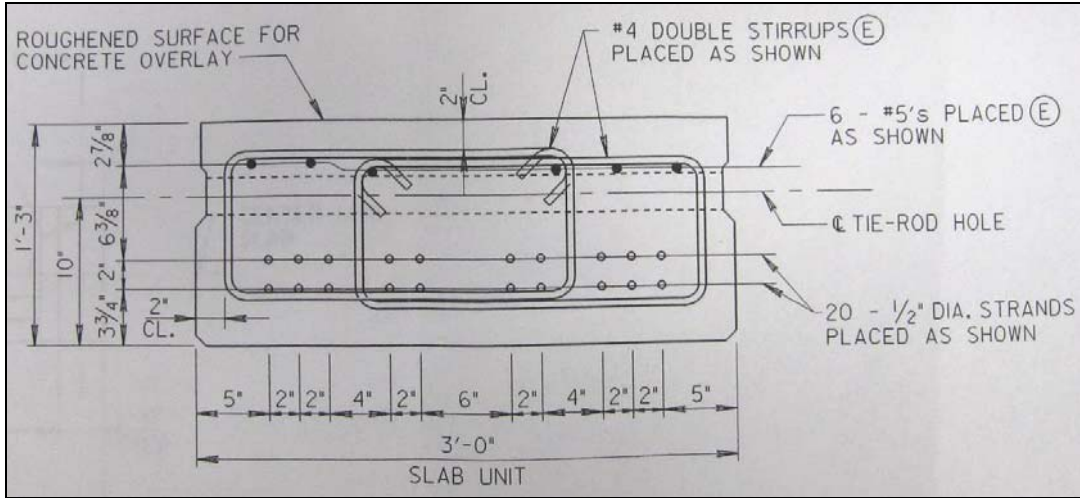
Structure No. 0901100 Wallace Creek Bridge (Slab Detail at Midspan)
